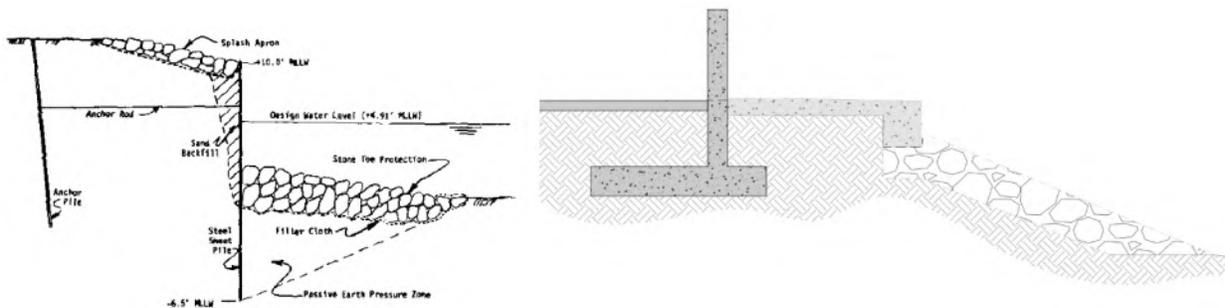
Typical section of a bulkhead (left) and revetment backed by a seawall (right).
